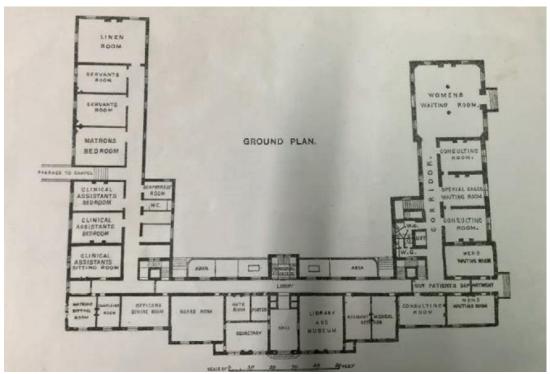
Floor plan of the Main Hospital Building, with north and south wings
